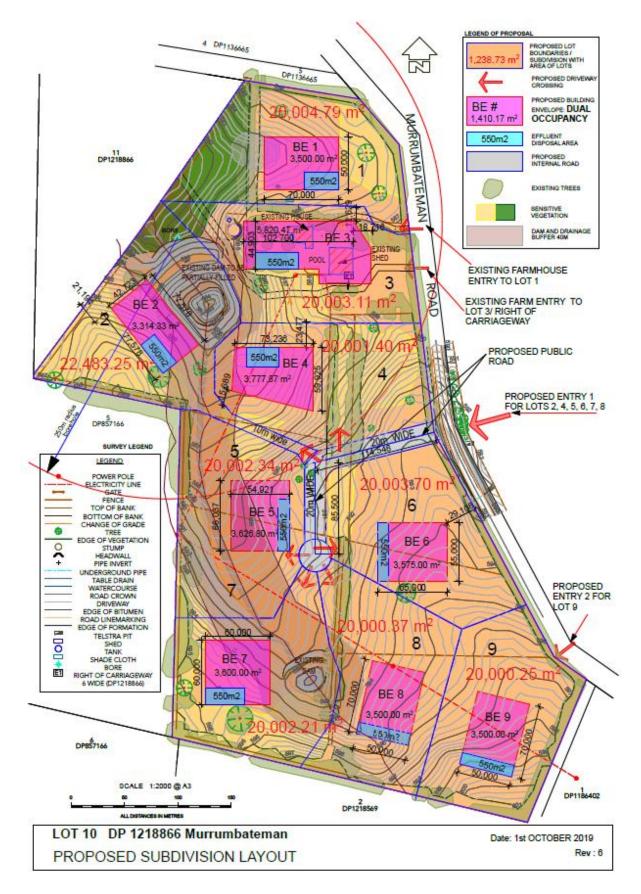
Proposed subdivision lot layout with building envelopes and effluent disposal areas
